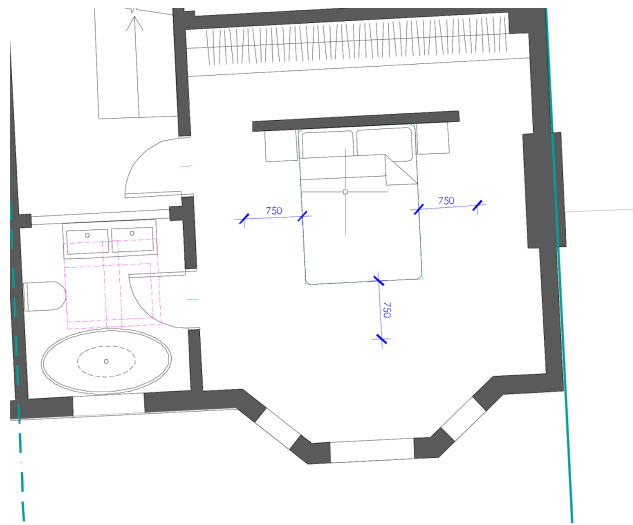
Sample plan of the proposed first-floor bedrooms within plots 3-6. Extract from drawing 2041.03.03.Pln01.023.
